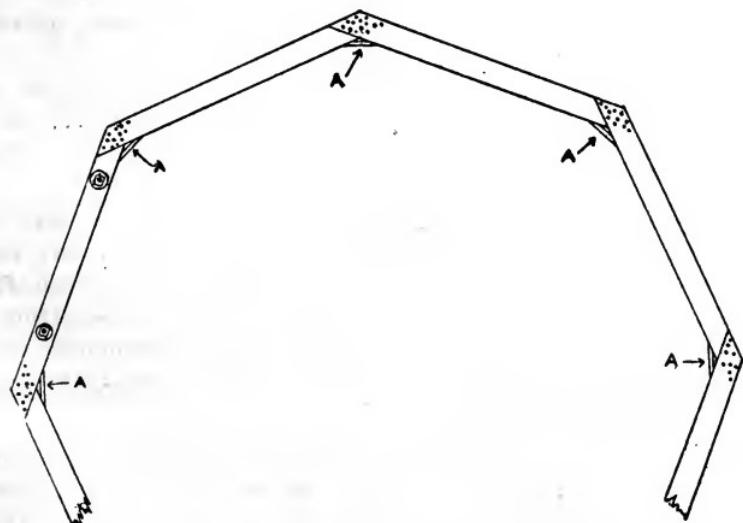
Showing method of laying sill and bolting same to foundation for an octagonal silo.
